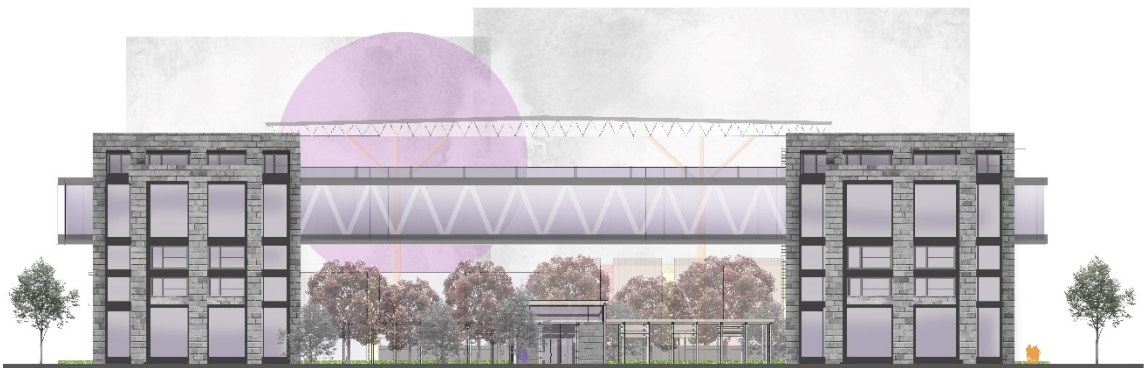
Elevation on N. Wolfe Street to Welcome House
